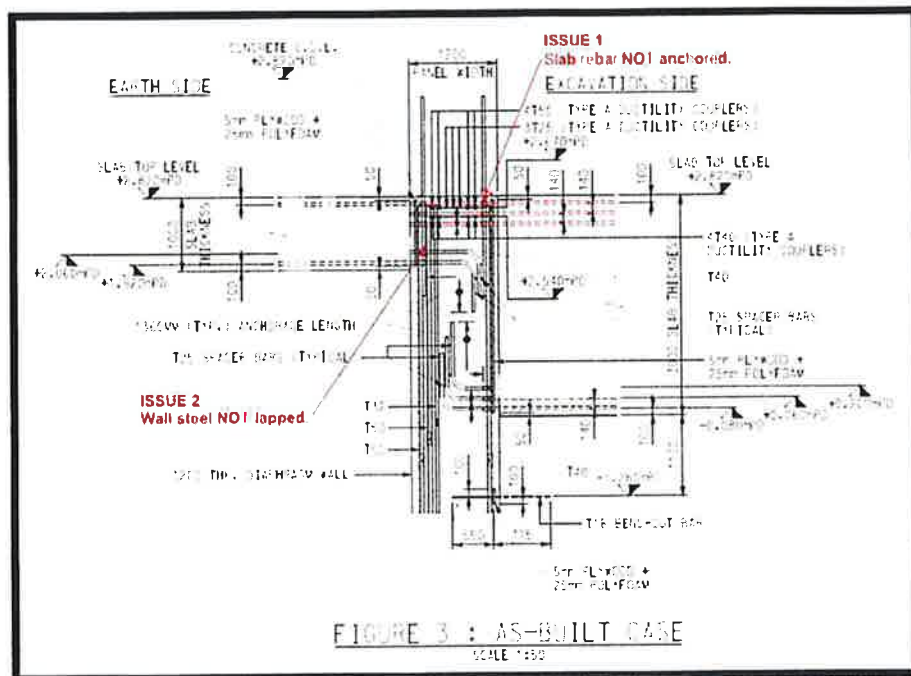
As-built diaphragm walls without U-bars and anchorage (from the PWD-059A3 Report)
